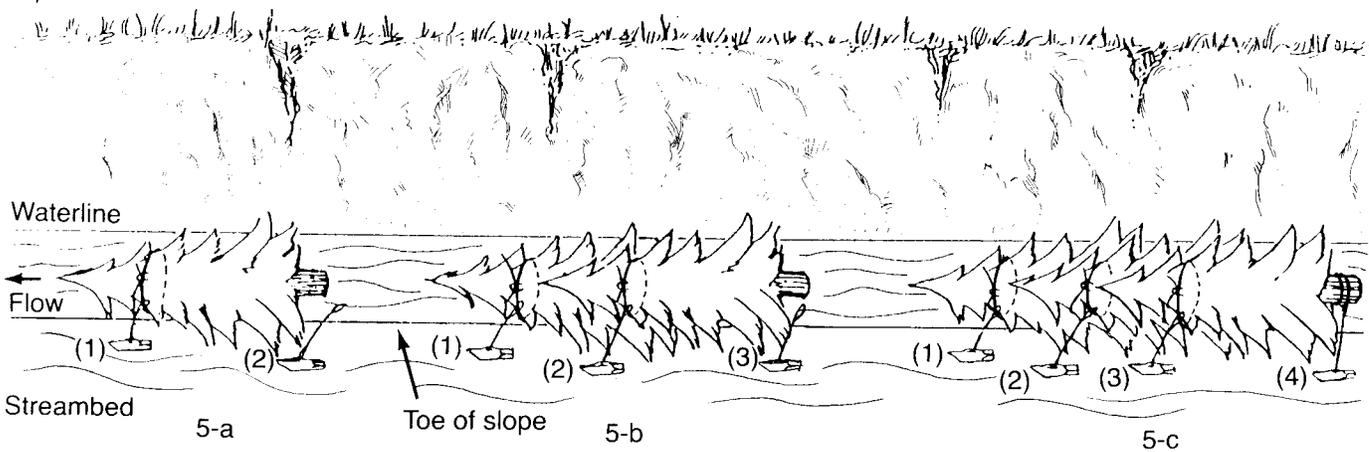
Constructing a One-Row Revetment - Figure shows the general placement of cable. Cable should be wrapped around trunks only and not the outside branches. Pull cable together as tight as possible and clamp tightly.
